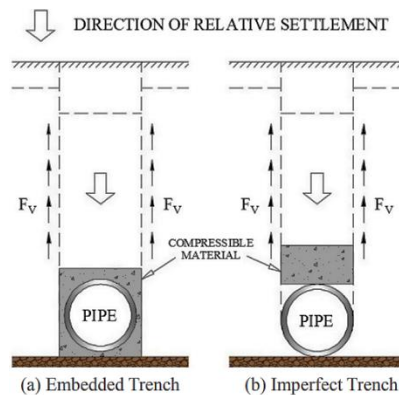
Mechanism of [24]: (a) embedded trench installation (ETI) (b) trench installation techniques (ITI).
